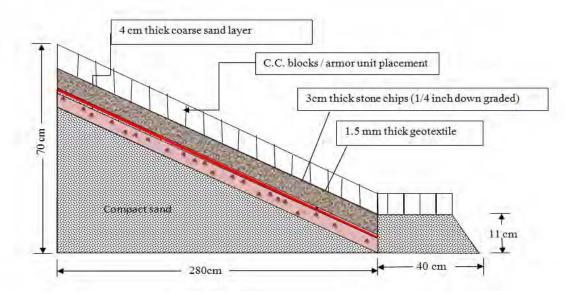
Detail design of revetment with toe protection and filter layer (condition-1)
